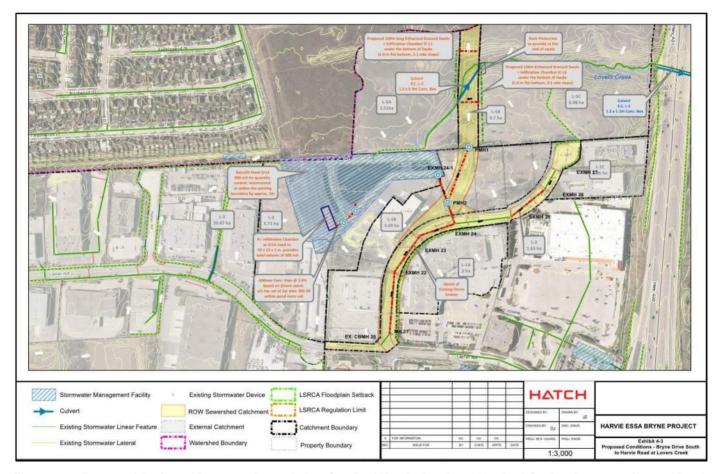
Proposed Drainage Concept - Bryne Drive, South of Harvie Road and North of Caplan Avenue at Lovers Creek
